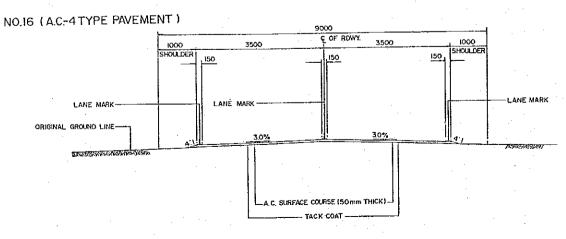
TYPICAL CROSS-SECTIONS (3/4)
